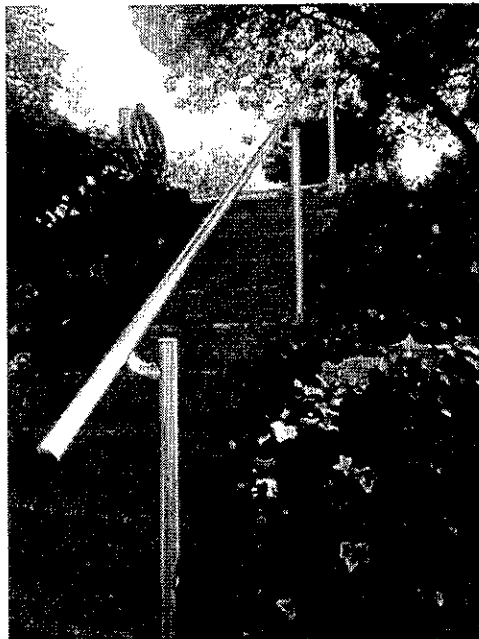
Example of an installed railing provided by the railing manufacturer. The proposed railing will be black, not mill finish aluminum.
